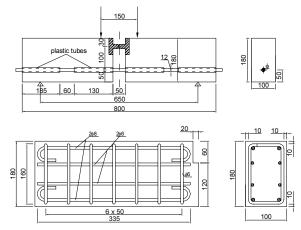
Size and reinforcement of beam test specimen type I (dimensions in mm).
